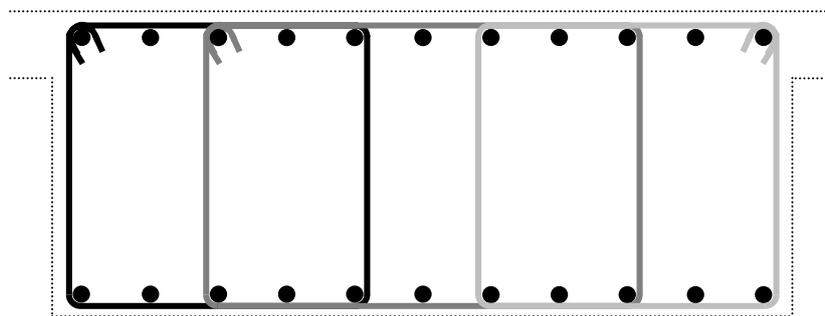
Common configuration of stirrups in wide beams according to ACI-CRSI (2010).
